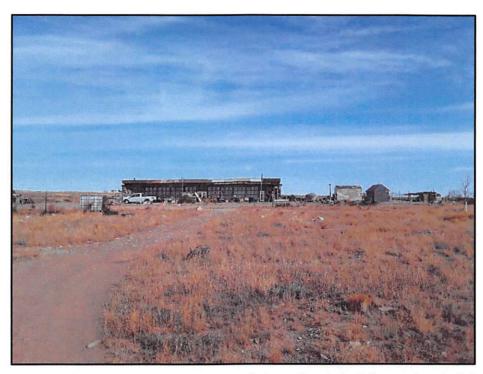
View of off-grid homestead, facing north toward main building and outbuildings.
